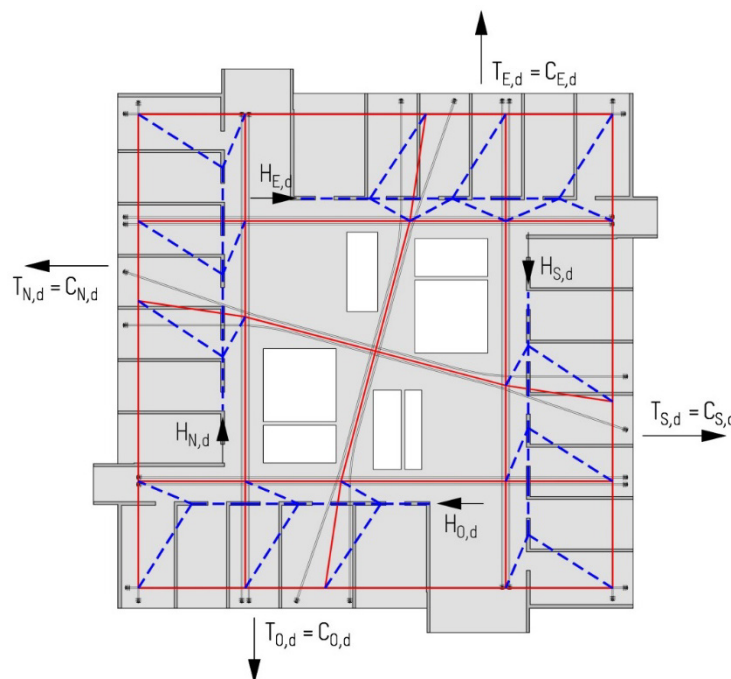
Placement of prestressing cables in the slab above the second floor and a possible strut-and-tie model (drawing by Pedrazzini Guidotti sagl, Lugano)
